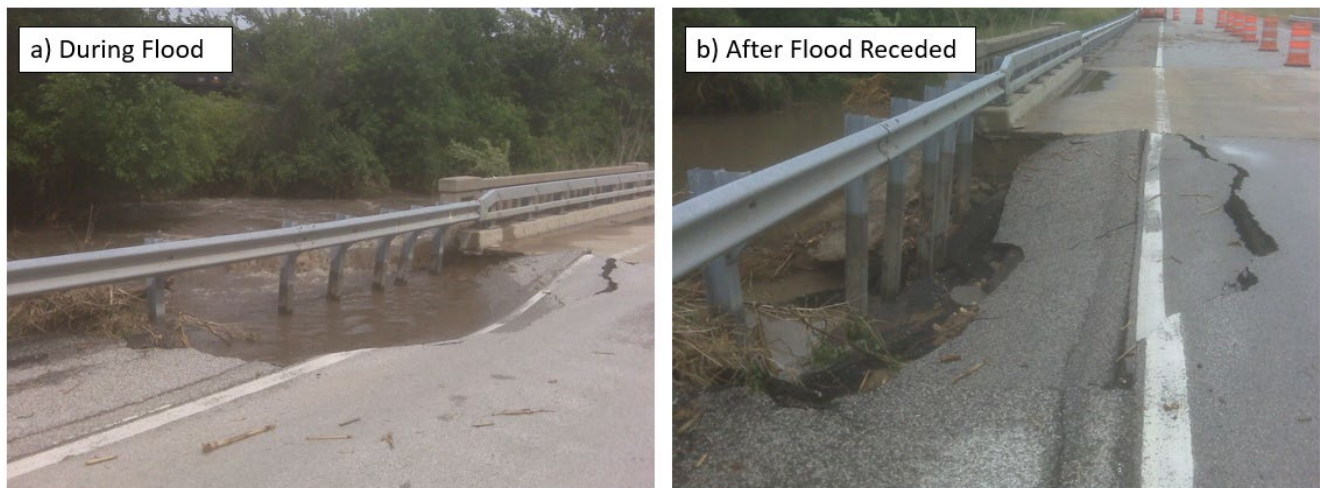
Photo. Washout of bridge at IL-104 in Morgan County, IL.
